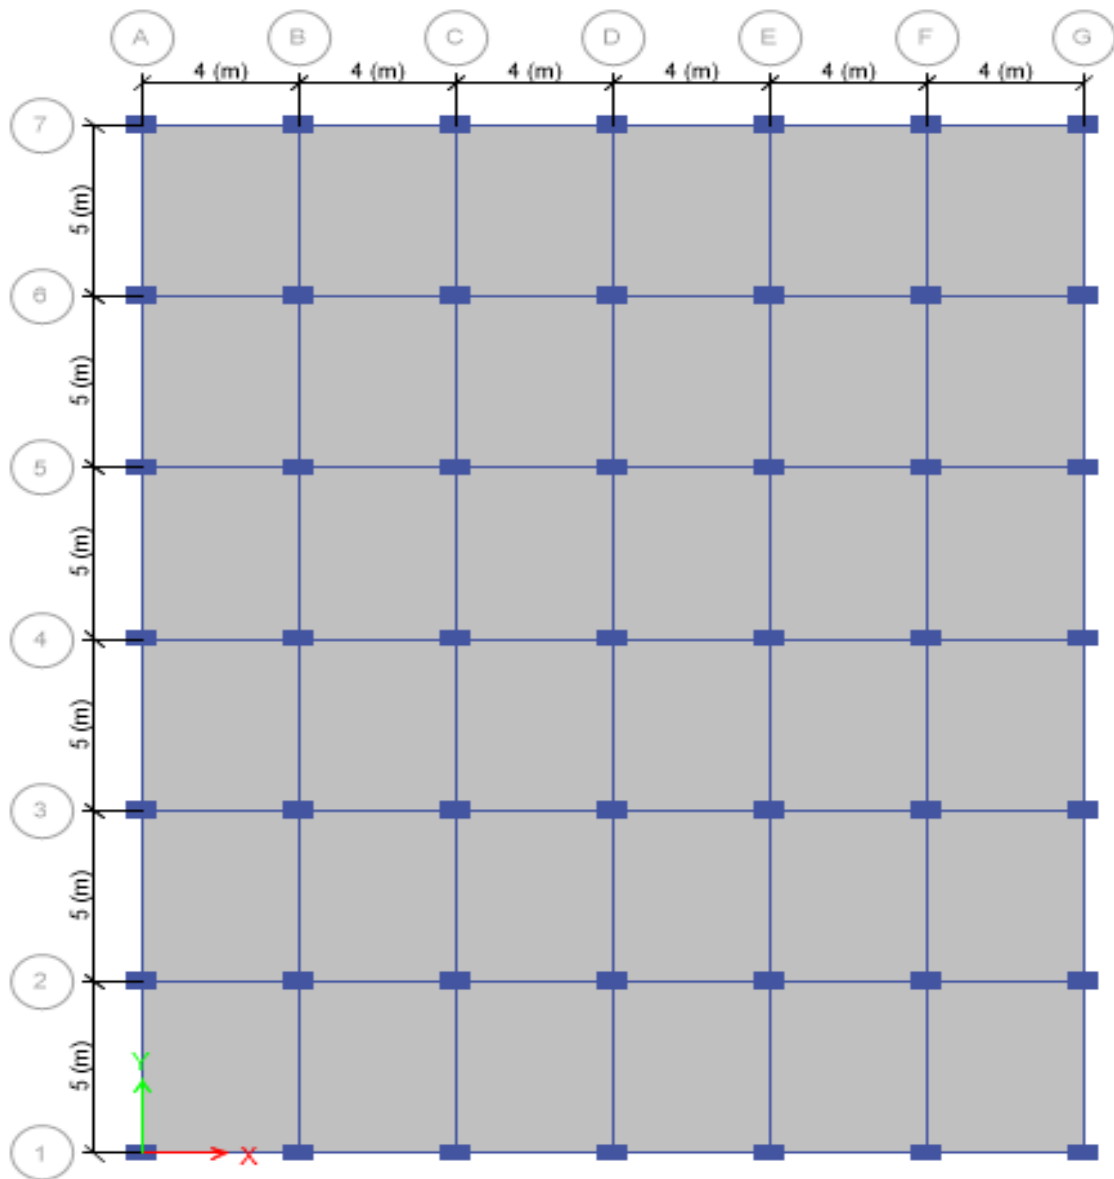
floor plan of regular structural model storey 8 and 15 building
